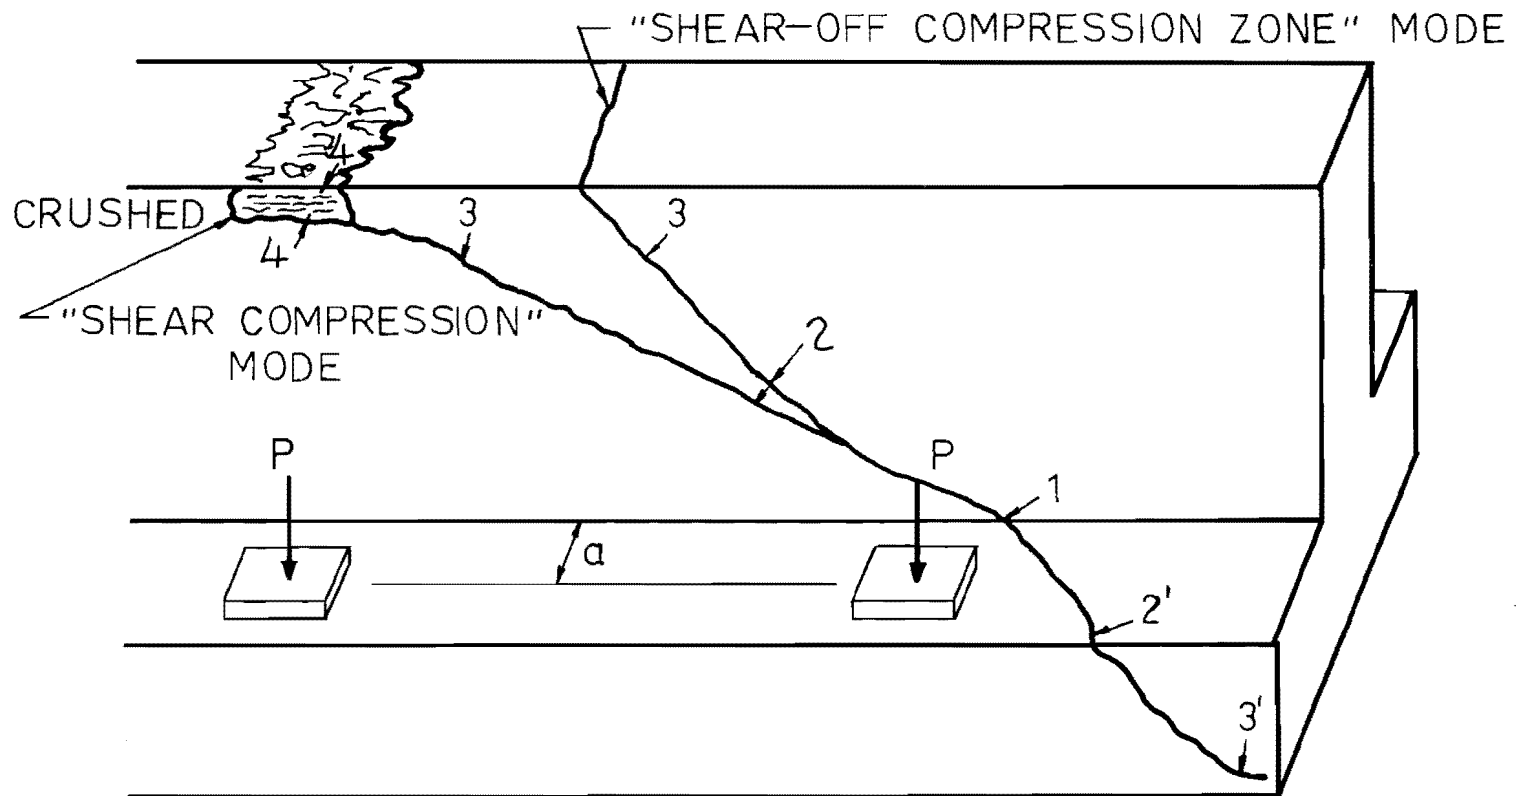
TYPICAL WEB FAILURE PATTERNS
